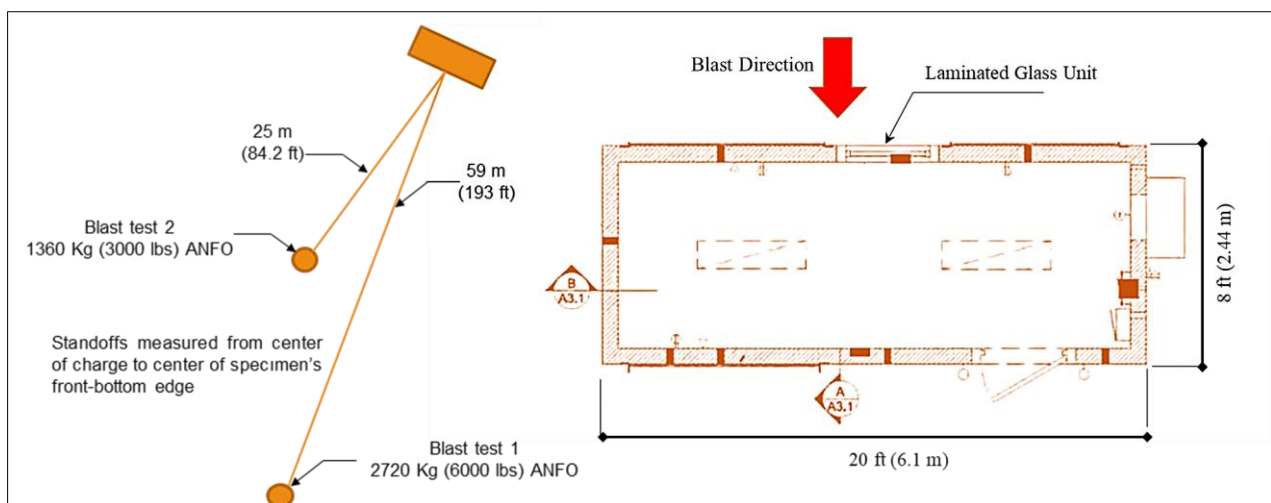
The blast testing site plan and the installation of the laminated glass unit
